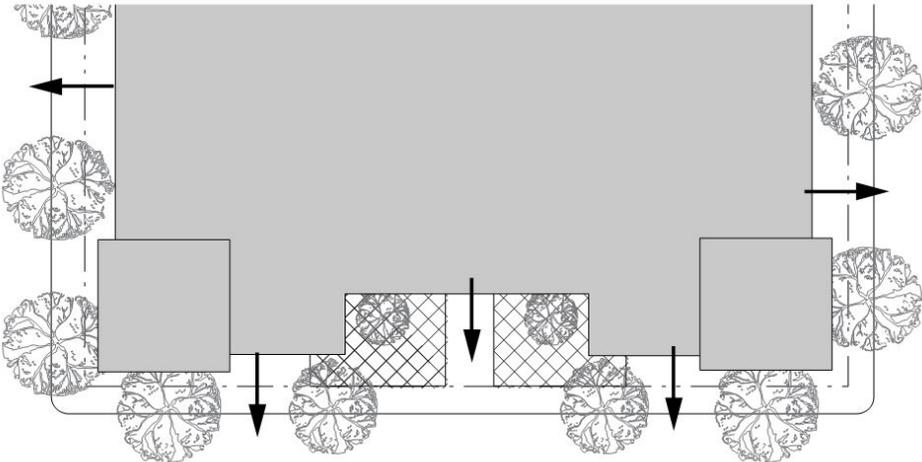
F.2: SIDEWALK CONNECTIONS
